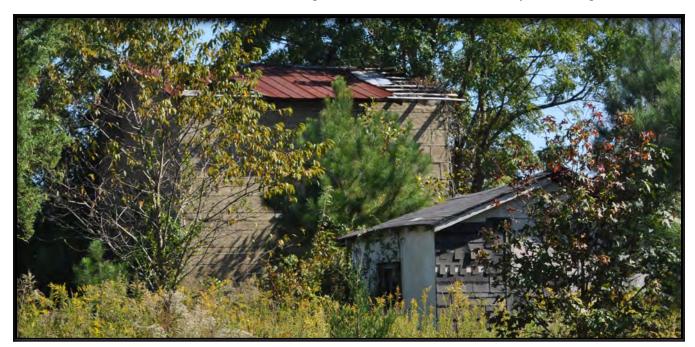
View from House Looking Southeast to Shed and Frame Tobacco Barn
